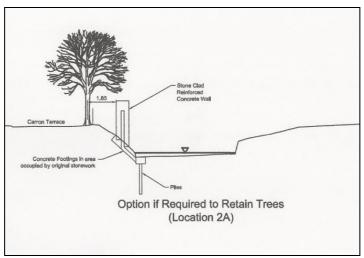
installation of retaining wall beside the Carron Water using mini-piles
